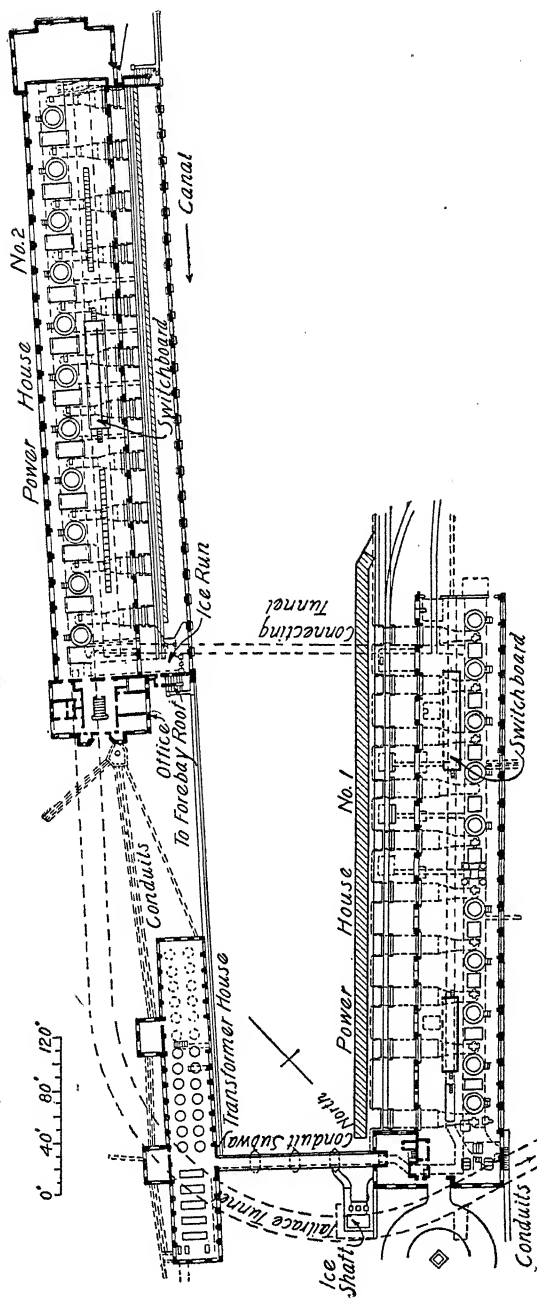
Plan of Power Houses, Canal, and Upper End of Tailrace Tunnel of the Niagara Falls Power Company
